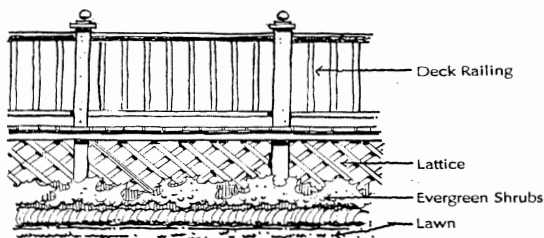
Deck Foundation/Perimeter Planting
